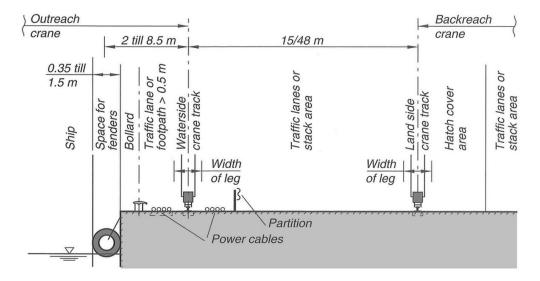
Example of the layout of the transshipment area of a container terminal (Quay Walls, 2014)
